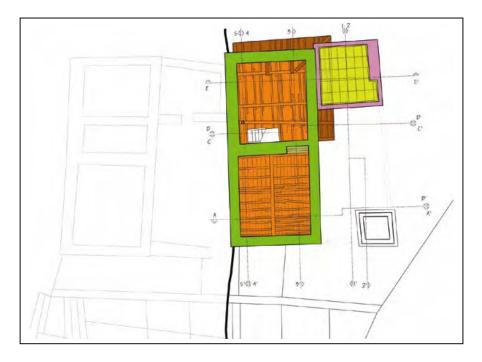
Mapping of material and construction systems on ceiling plan at +1.00
